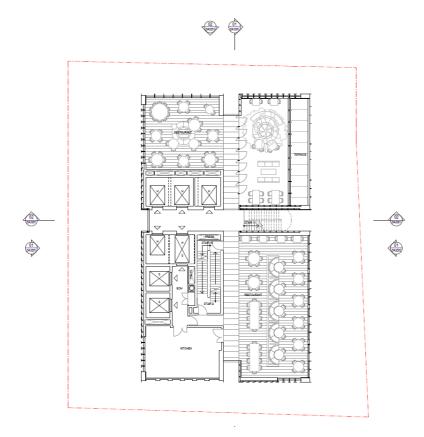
| Proposed level 57 (Source: Woods Bagot)
